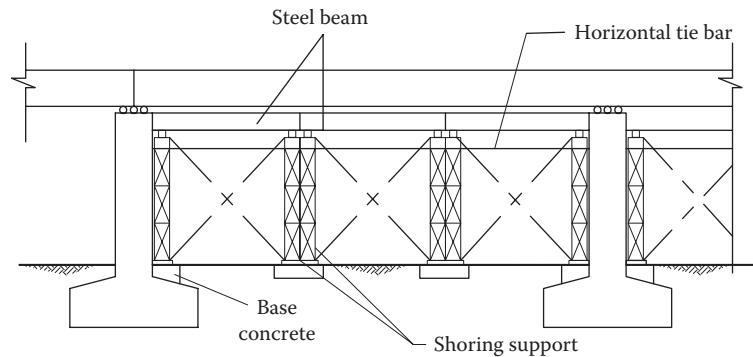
Steel beams (falsework) supported on vertical bailey trusses.
